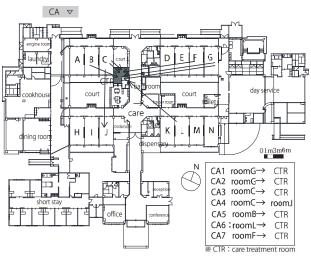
The Floor Plan Drawing the Transfer of Dead Elderly People
